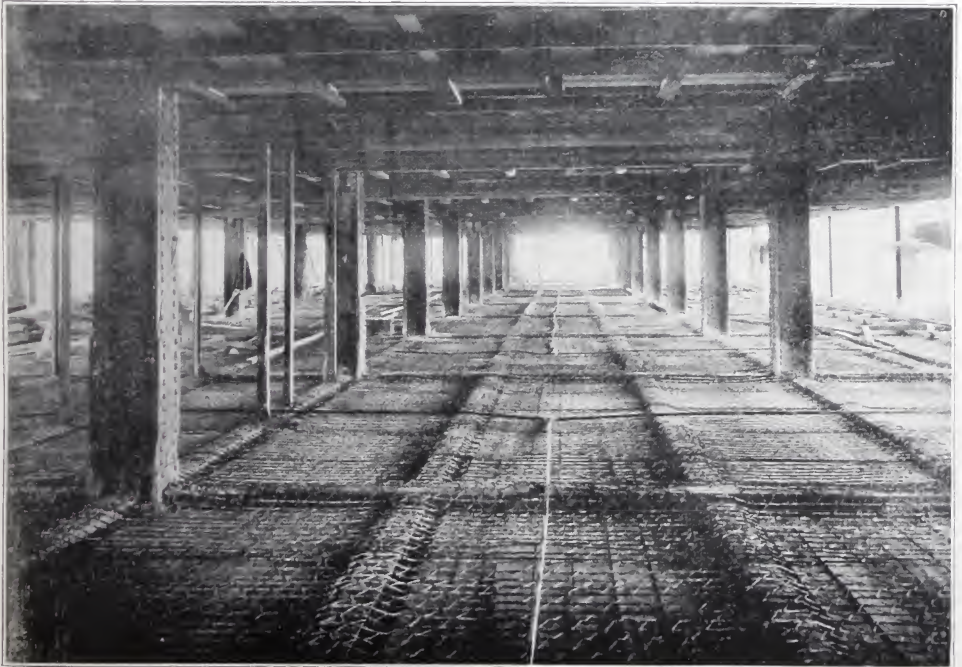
For the floors, walls, foundations, columns and beams of this storage warehouse over 200,000 square feet of Triangle Mesh Fabric was used.
